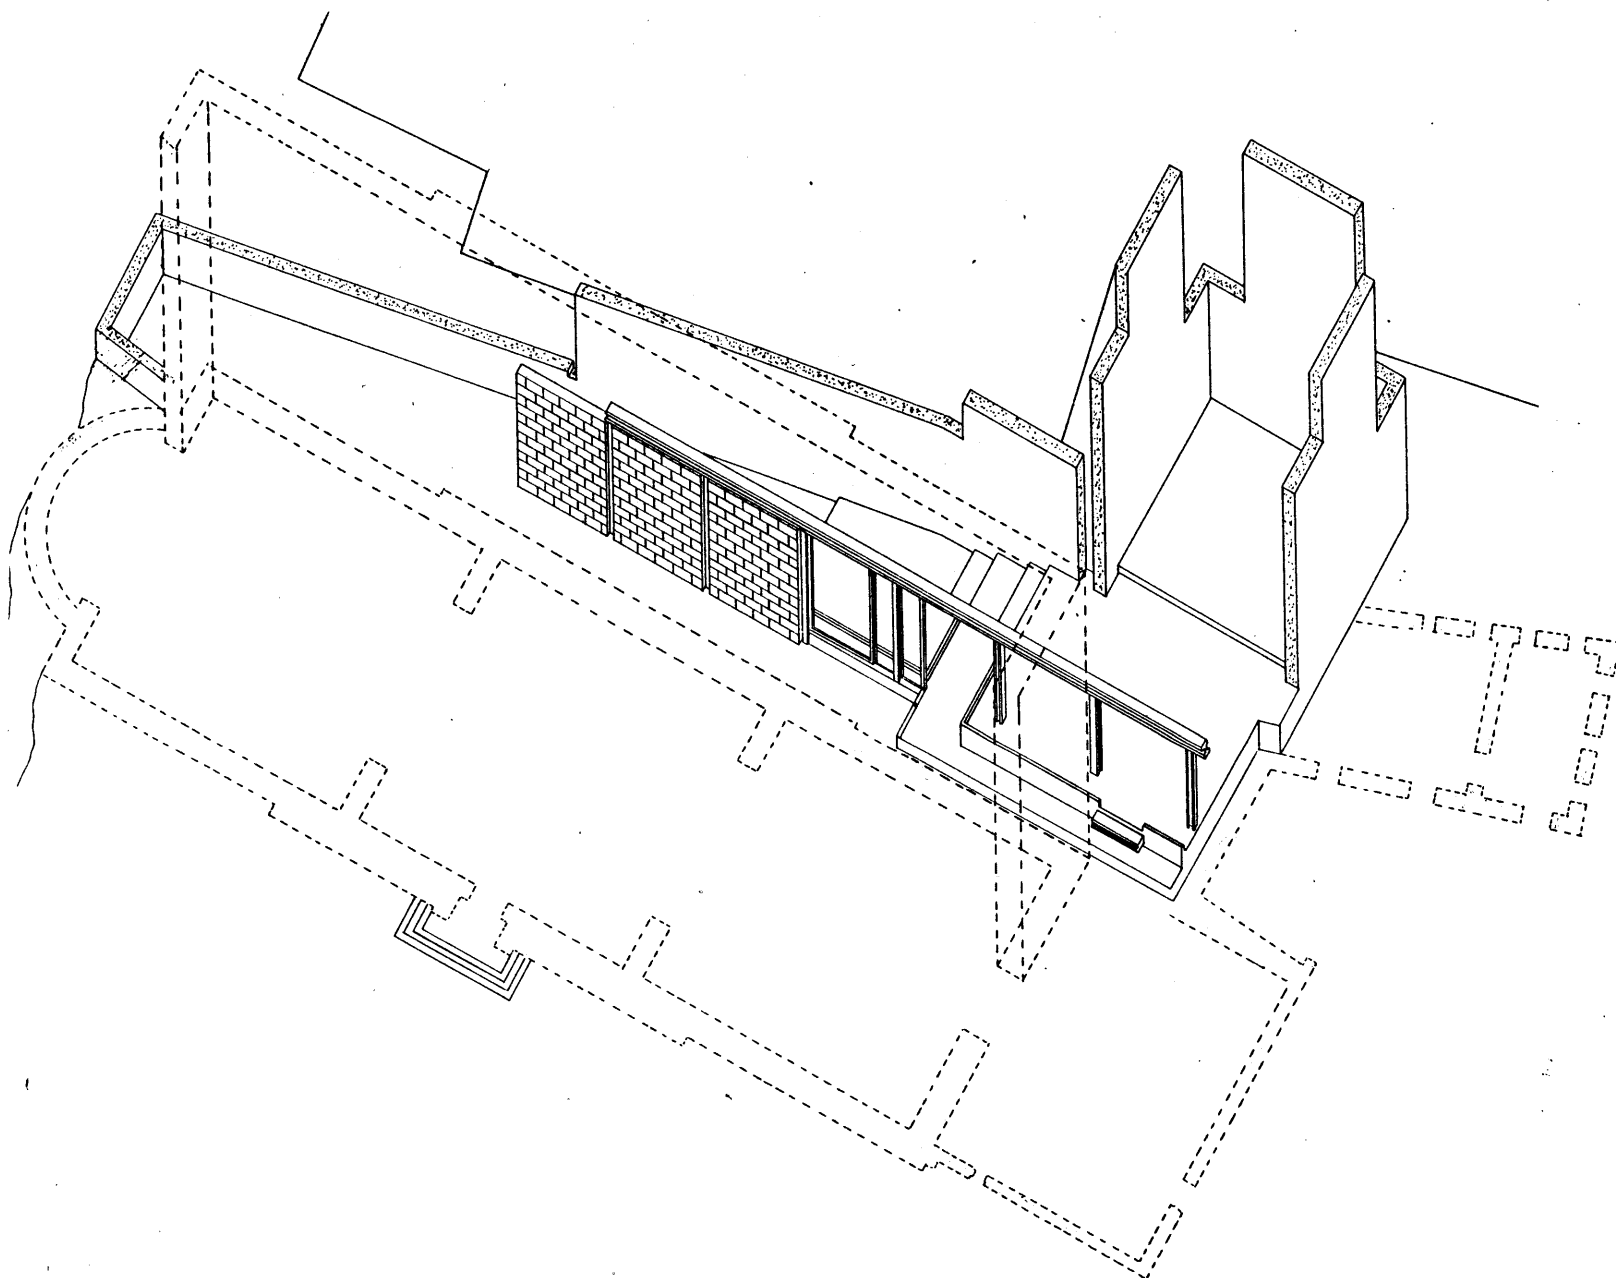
Relationship between basilica wall (dotted), column wall, and west reinforced concrete wall.
